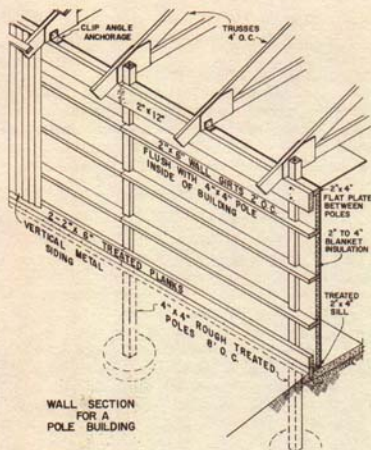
Square post wall construction with single 2" x 6" wall girts 2 feet on center.
